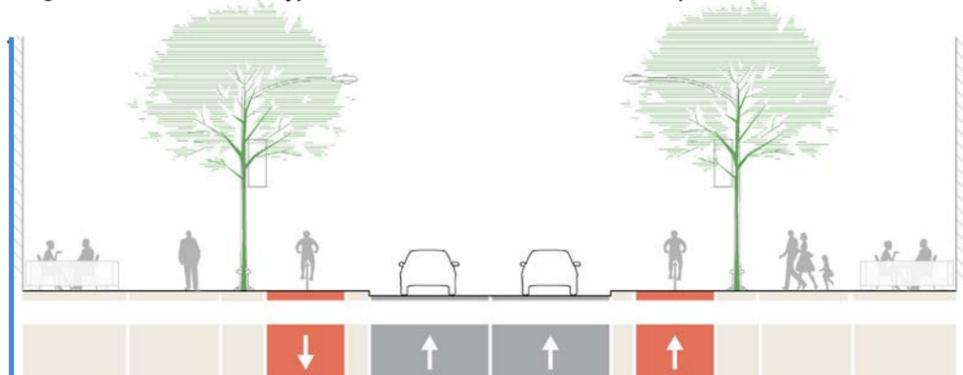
Sixth Street typical section I-35 to Brazos Street
